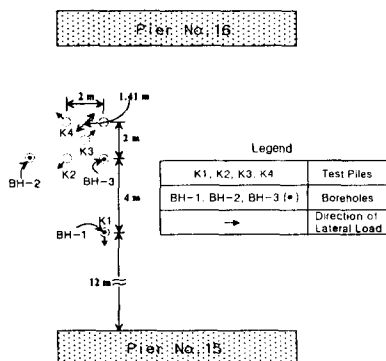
Plan View of Test Piles Arrangement and Borehole Locations (S-Bridge Site)
